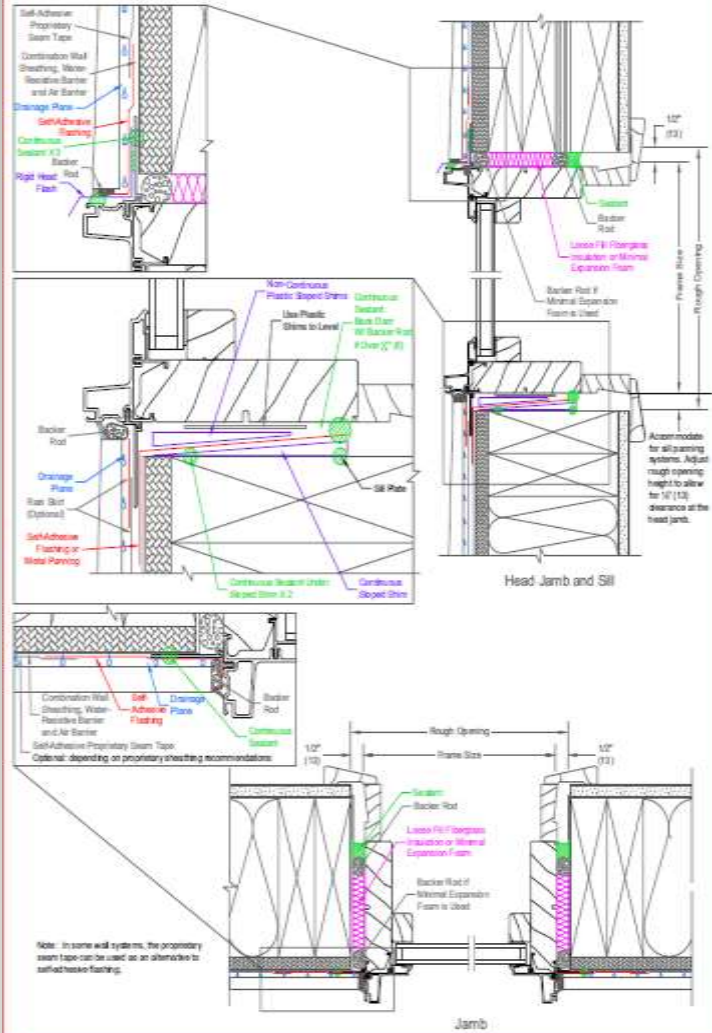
# DETAIL TO WALL INTERFACE AND EFFECT EXTERIOR DRAINAGE PLANE
